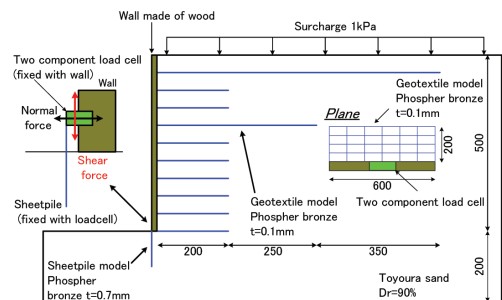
Cross-section of reinforced soil retaining wall with embedded sheetpile (unit in mm).
